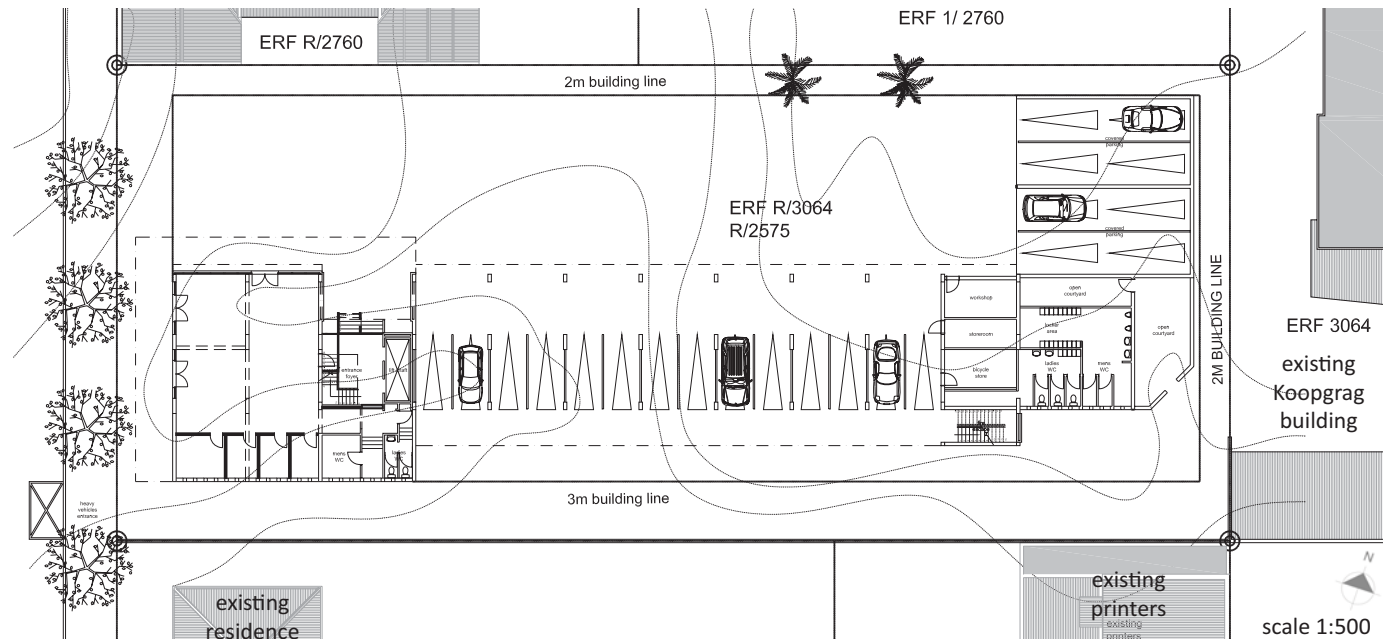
The ground floor plan of the Woltemade building after alterations were made to the internal layout of the street edge in 1959
